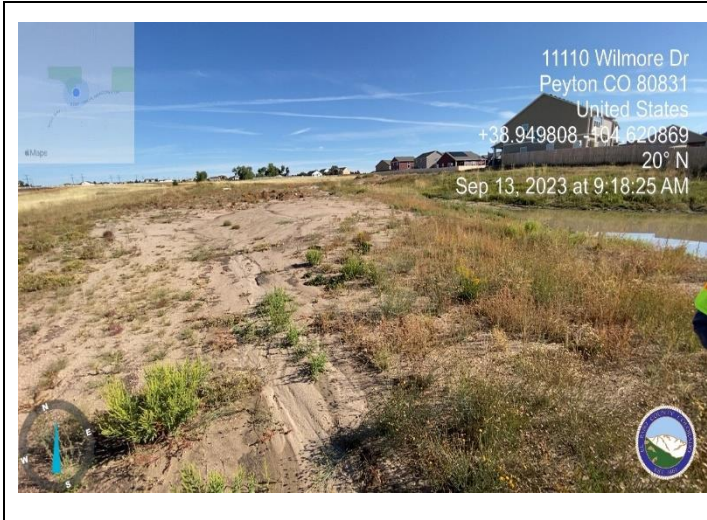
Install Swale B (which is tributary to North pond) per plan. See GEC Plan Sheet G2.03 and G5.01.
